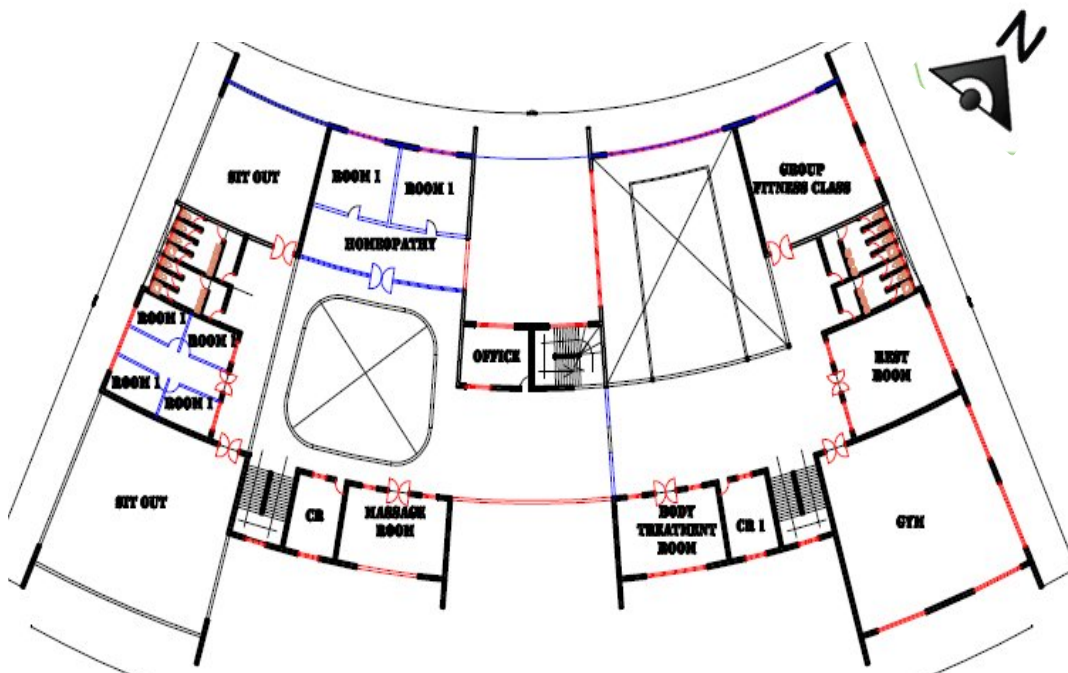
researcher's rendered ground floor plan of spa & health facility
